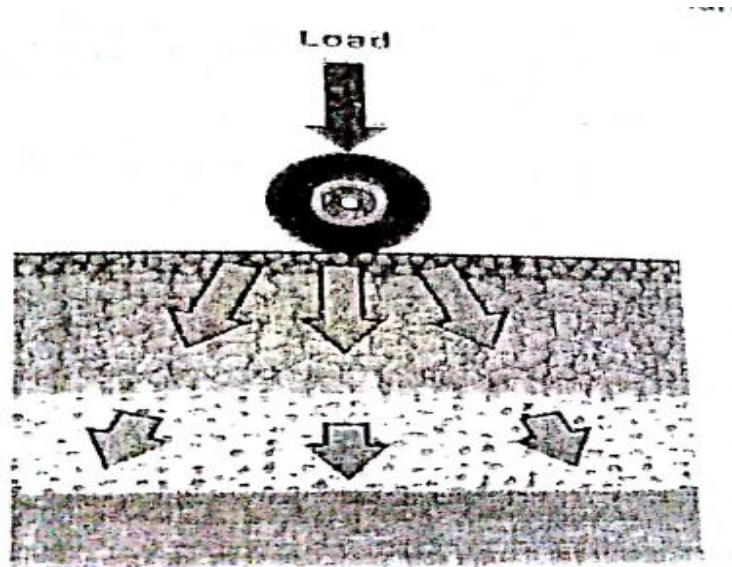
Function of Road Pavement in Transferring Loads (JKR, 2015)
